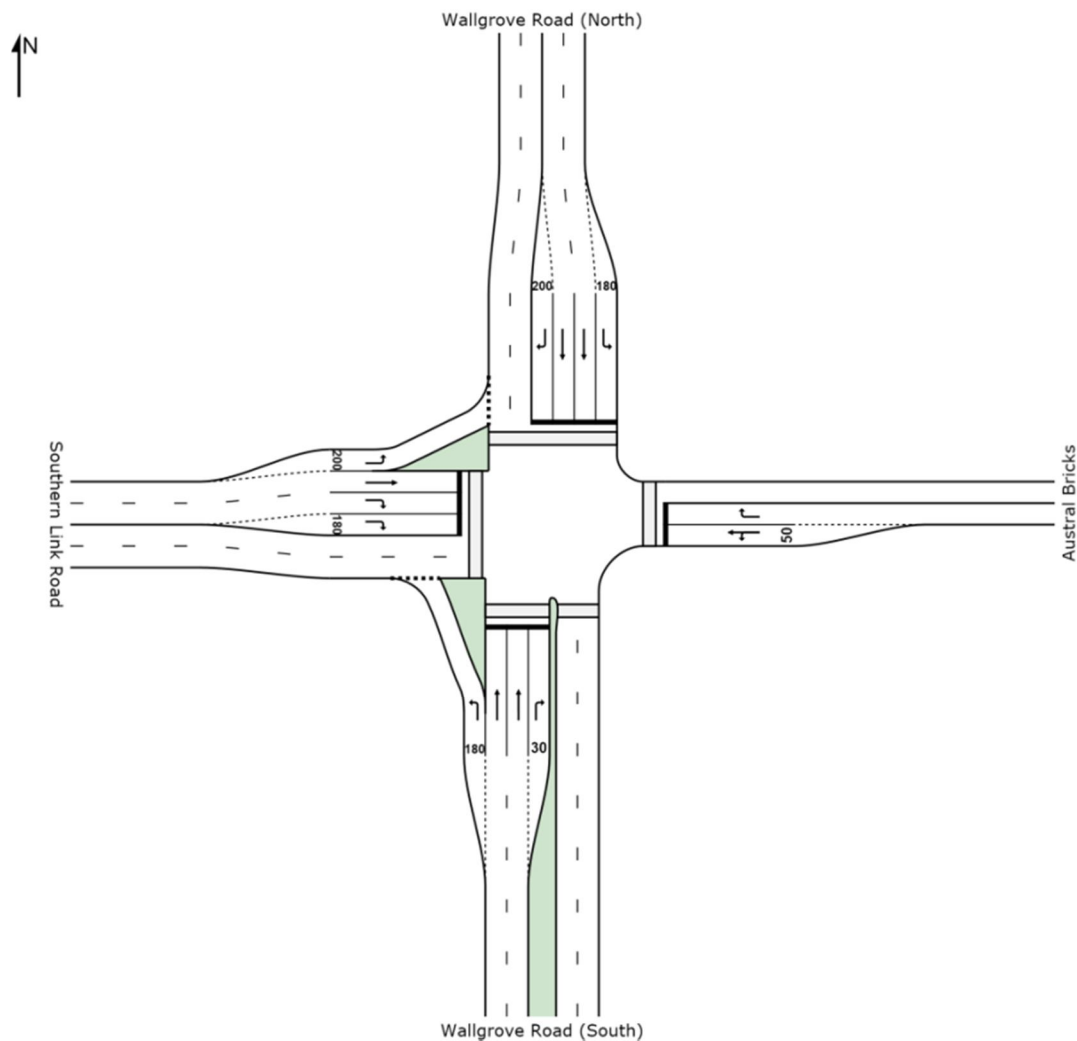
Interim (2021) Wallgrove Road/Gazcorp Access Intersection Layout
